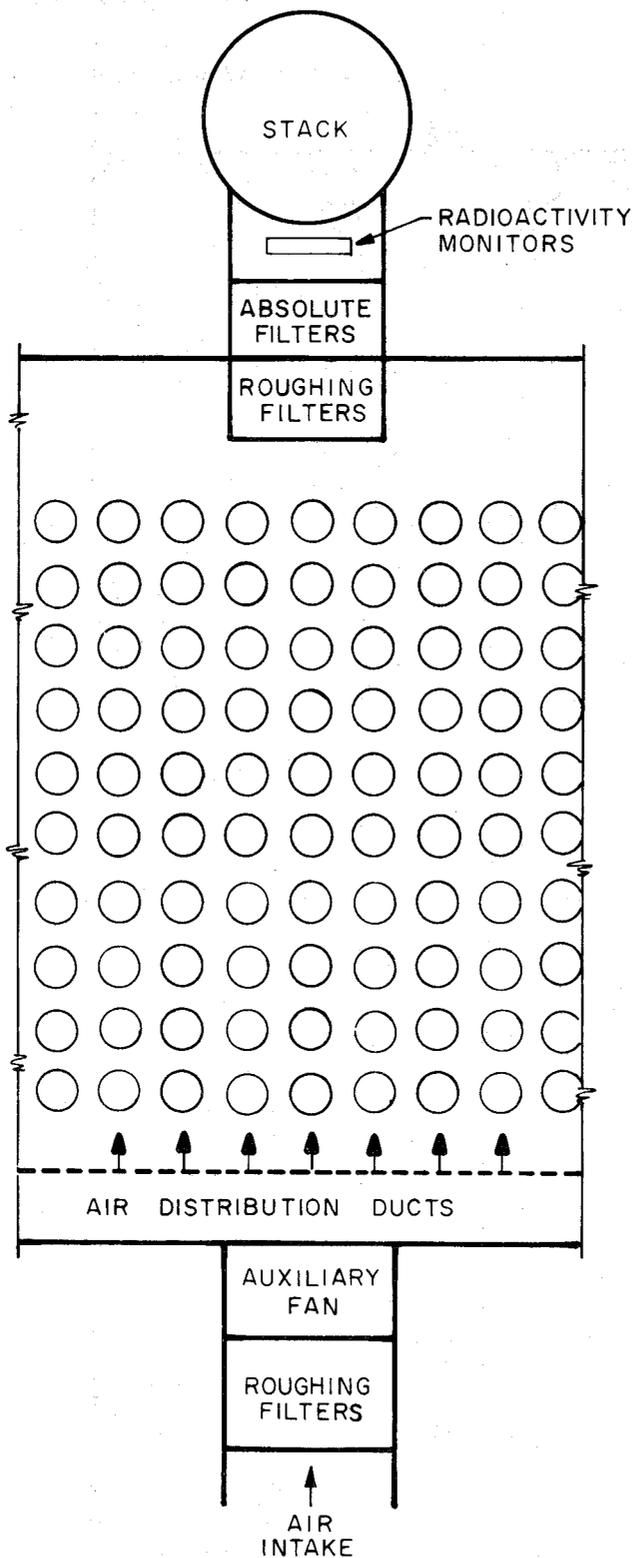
Conceptual Plan View of Vault (In-Line Arrangement of Waste Cylinders).
